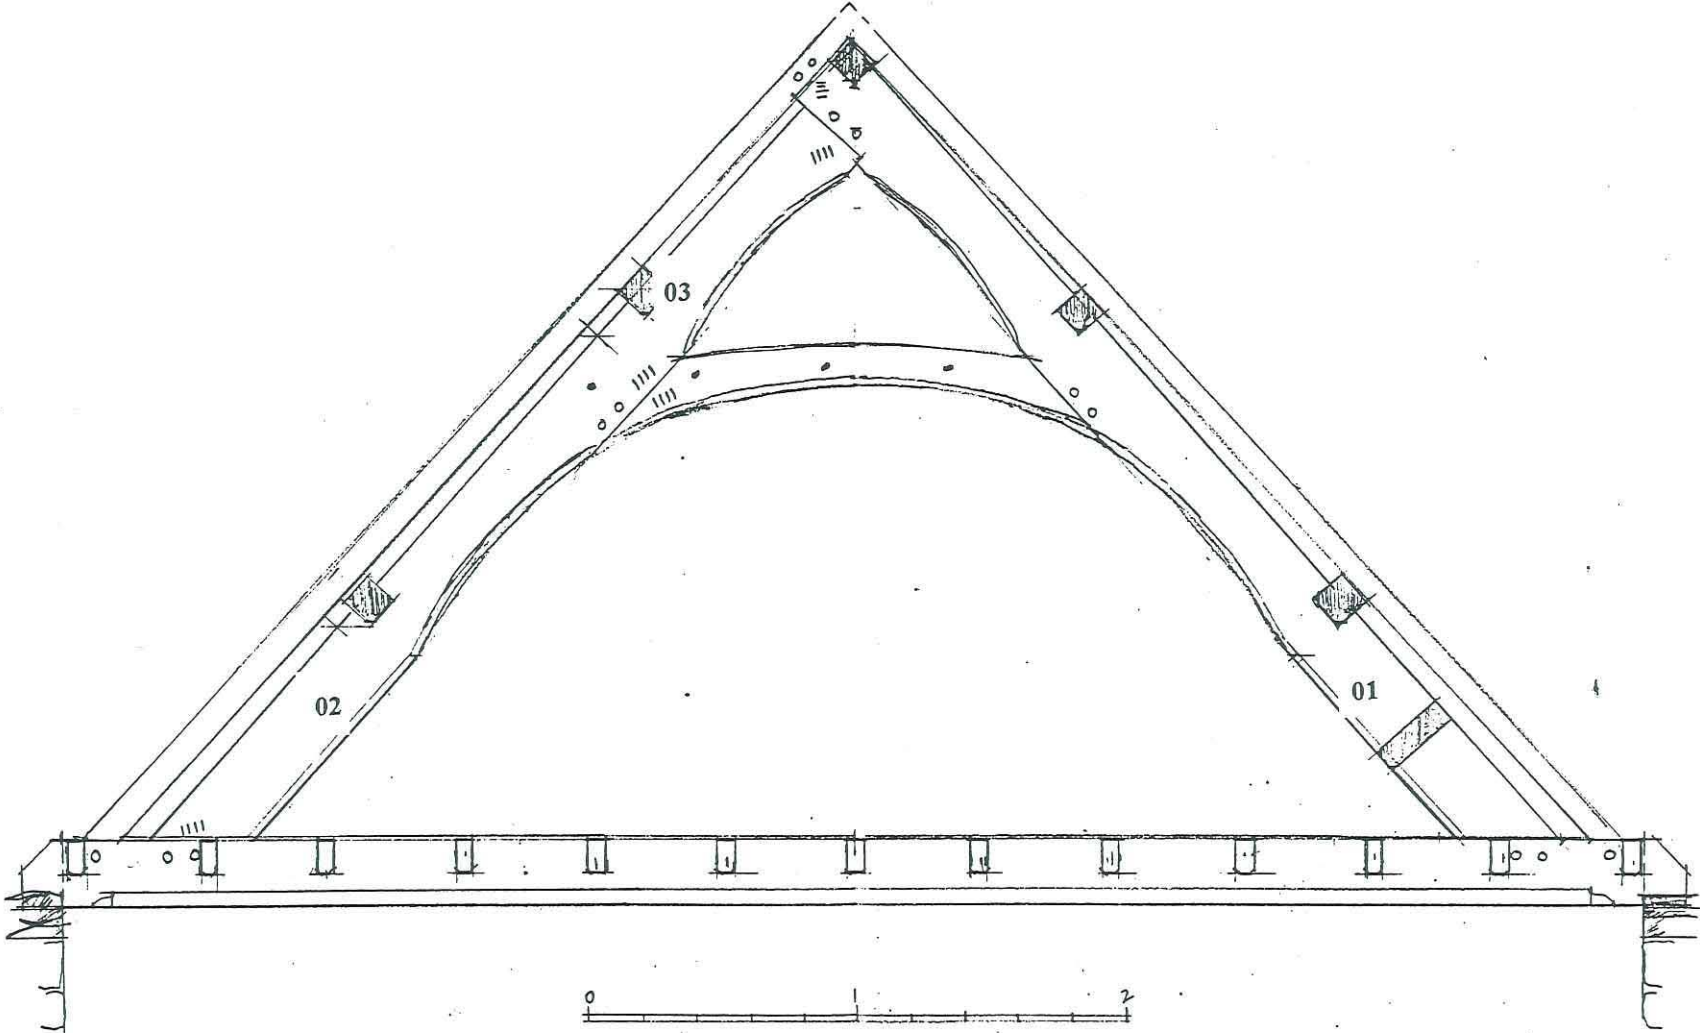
West range roof truss 4 (viewed from the south) to show sample locations
